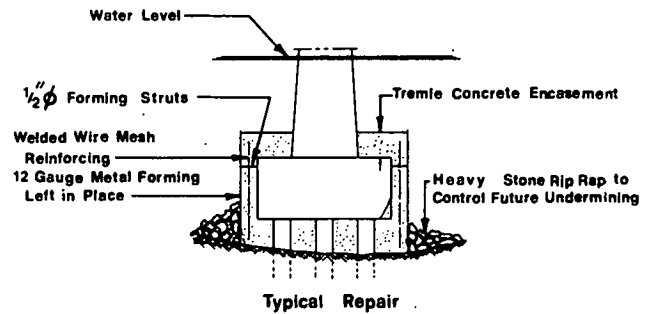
Example of sheet piling scour rehabilitation (9).
